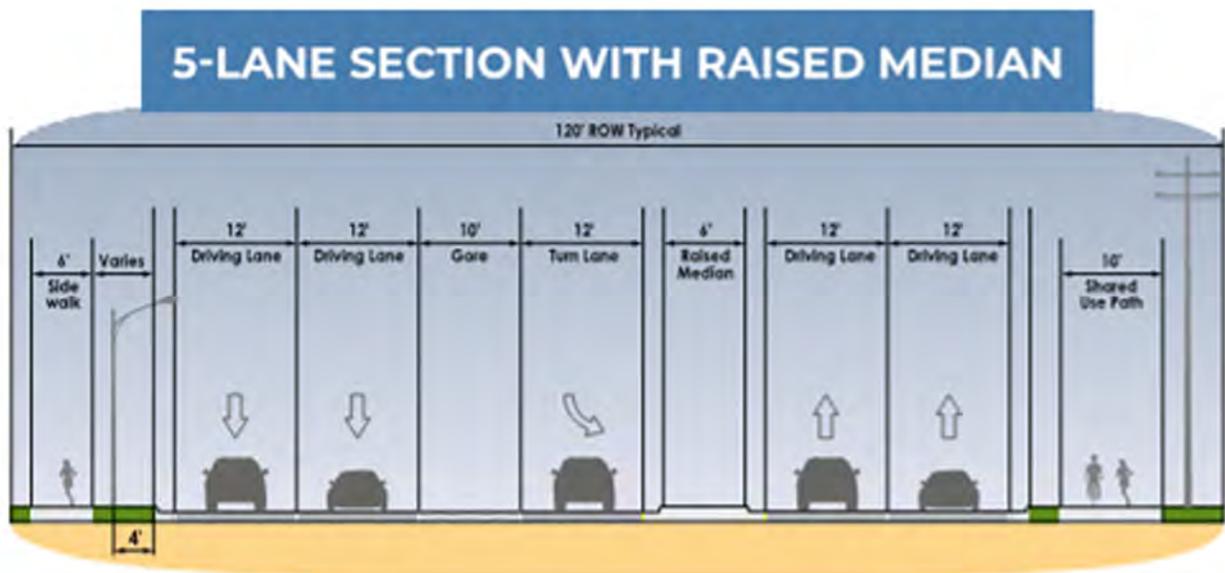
Alternative B, Proposed Typical Sections for areas with proposed intersection improvements
